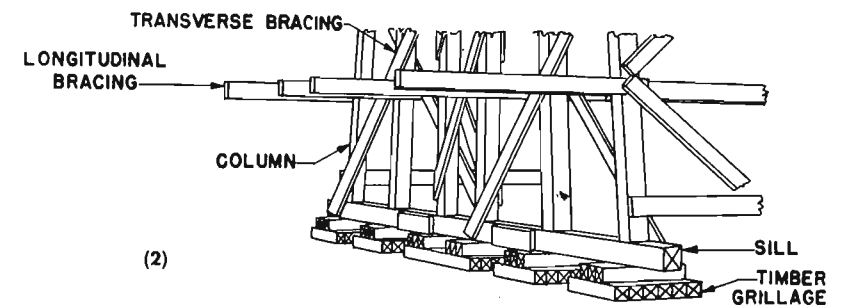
Highway bridge, class 50, double-lane, timber stringer spans, framed timber tower:
